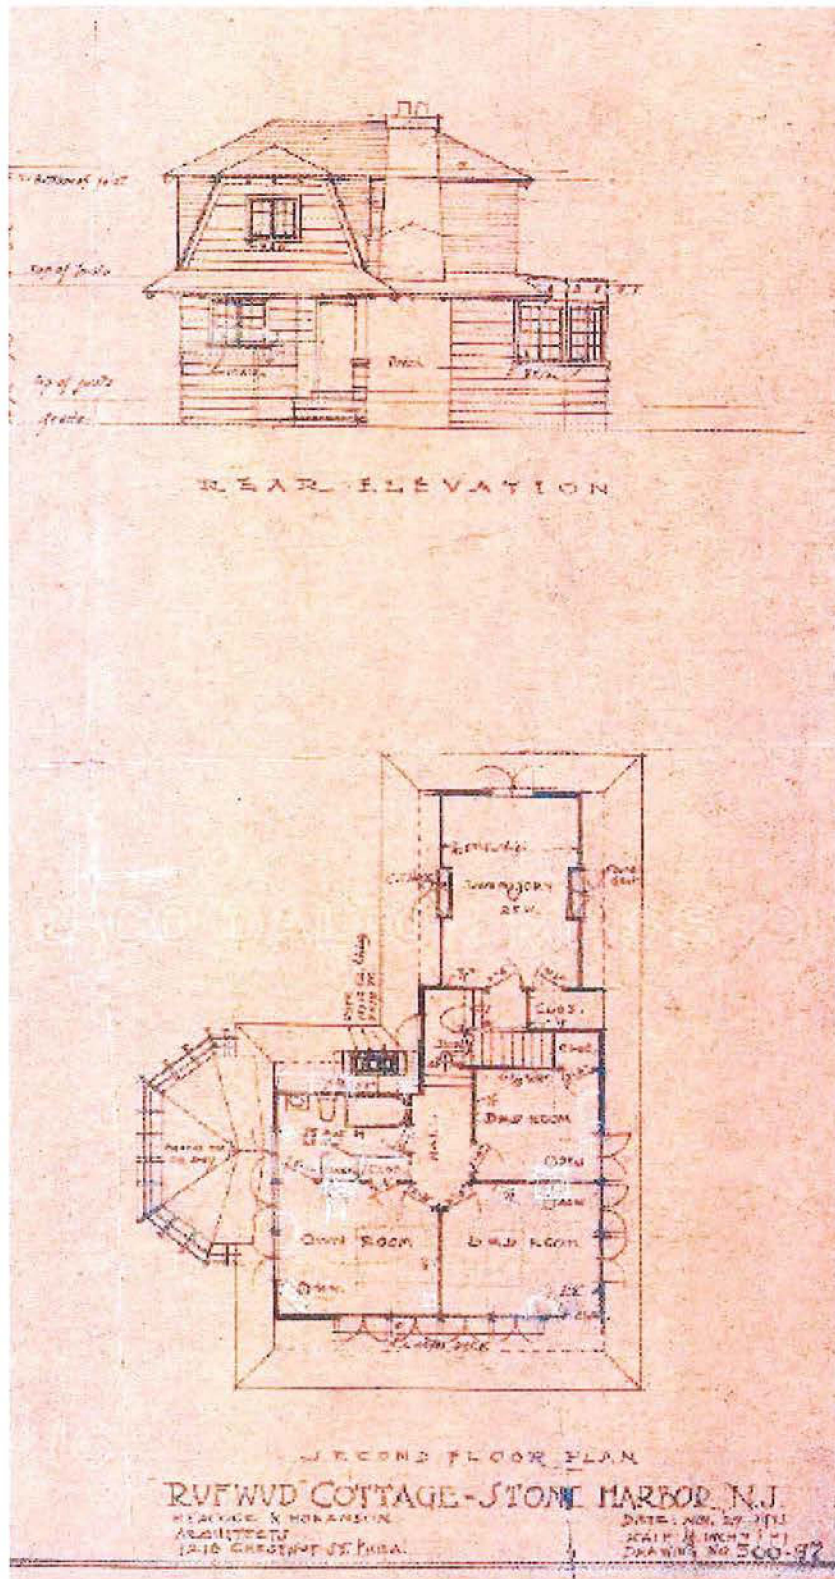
Hokanson's drawing of the rear elevation and second floor plan.
